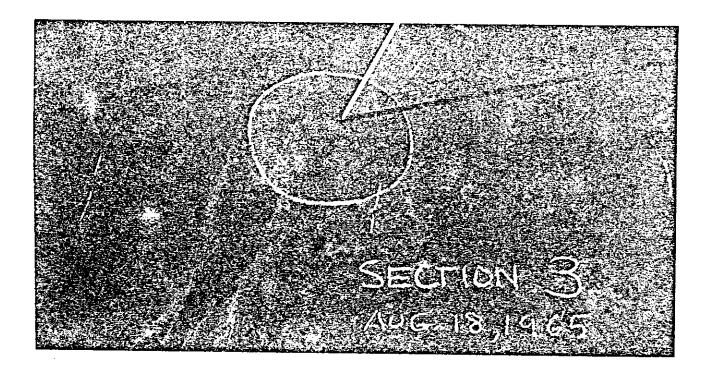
SECTION 3 WITH THE CLASS E ASPHALT-TREATED BASE, SHOWING THE CRACK DEVELOPING AFTER 2,868,000 LOADS. NOTE THE LIGHT COLORED PAVEMENT. THIS SHOWS THE DRIED SILT ON THE PAVEMENT.
